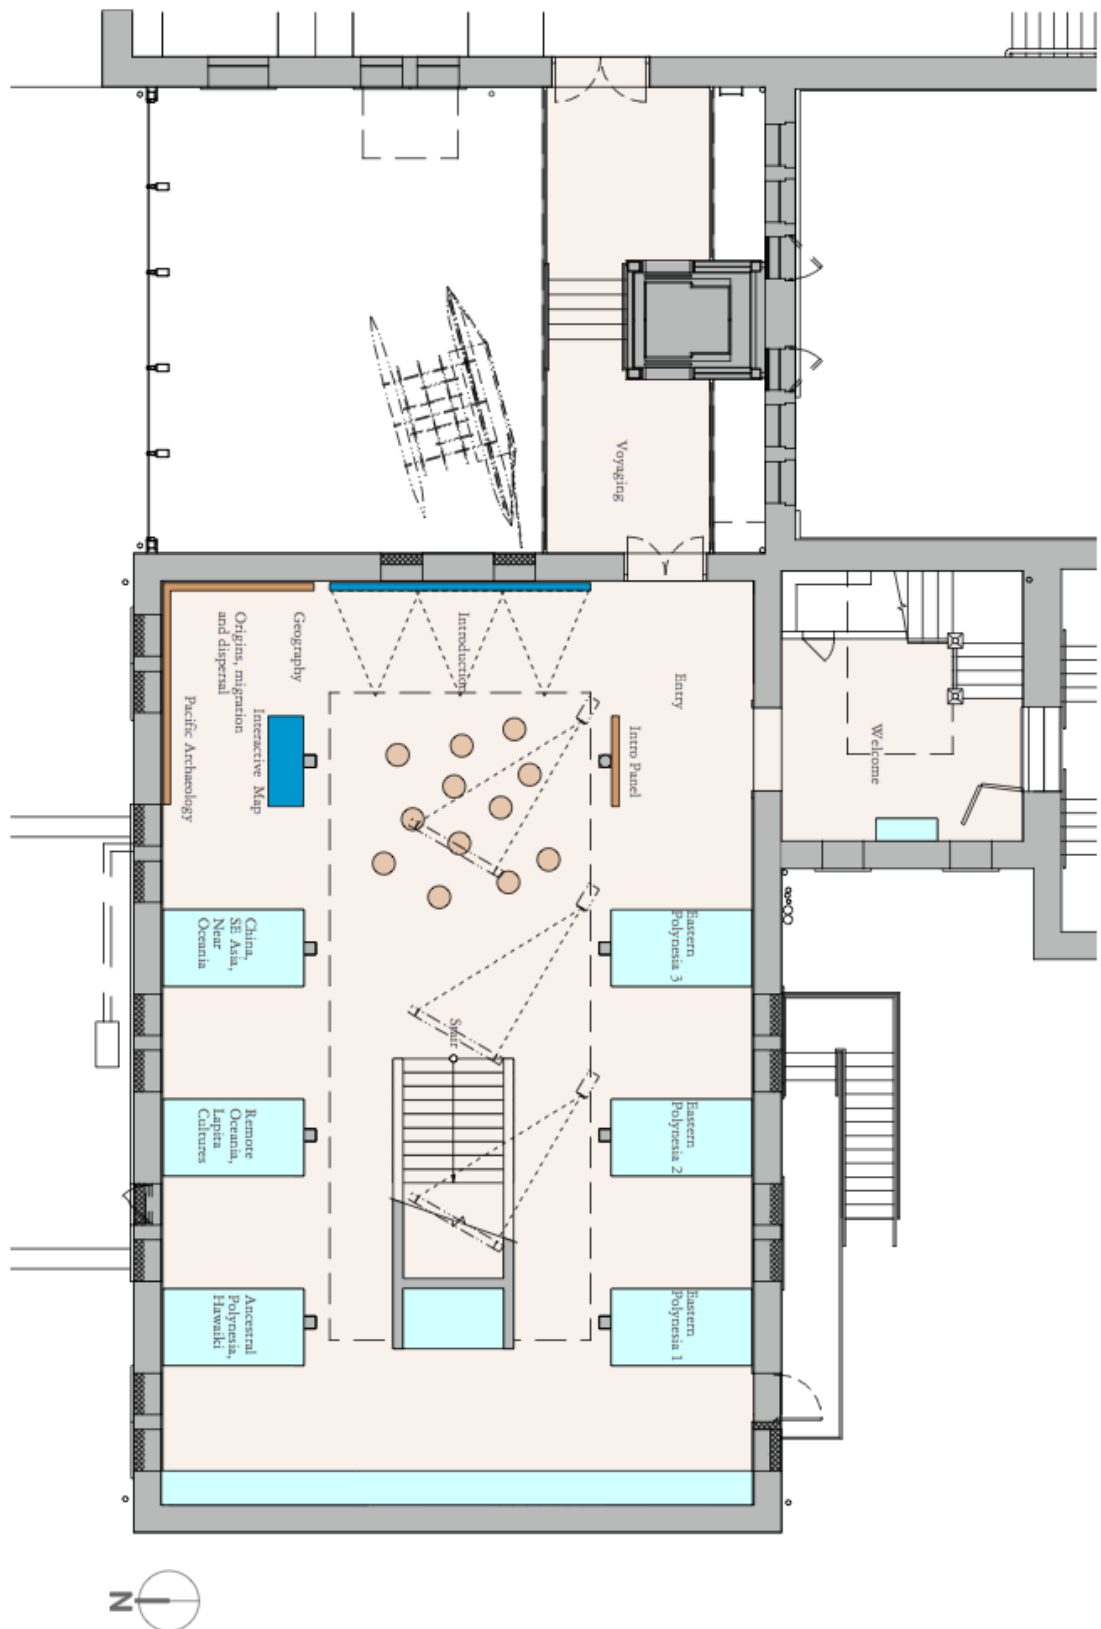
Floor plan PH1, BPBM. 31 March 2010
